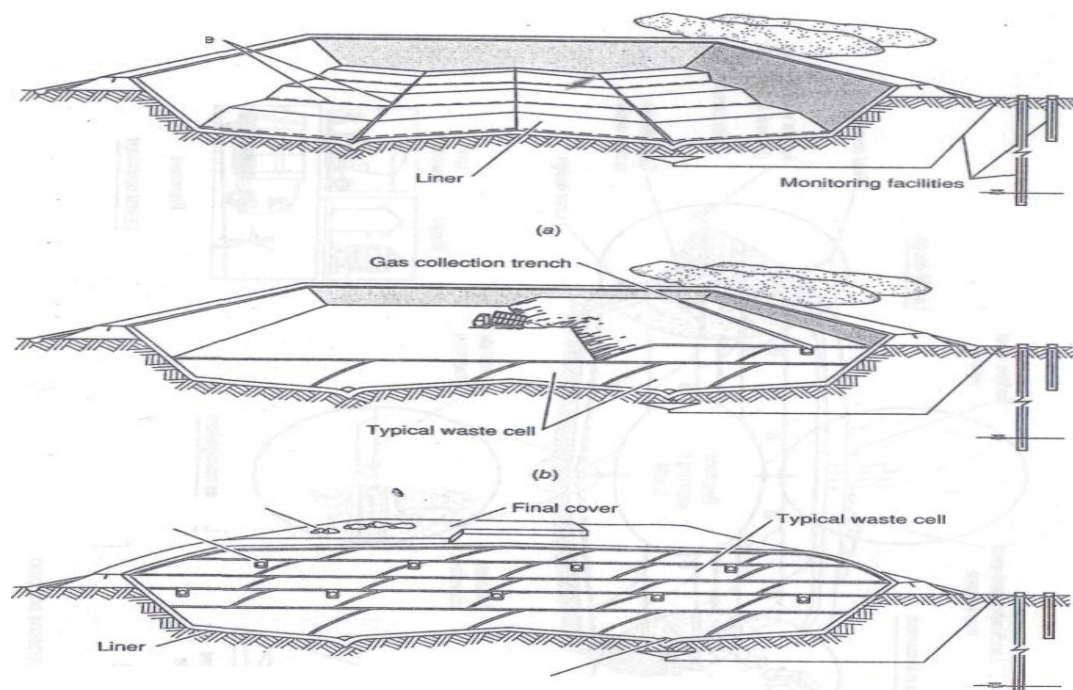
Development and completion of a solid waste landfill: (a) excavation and installation of landfill liner, (b) placement of solid waste in landfill, and (c) cutaway through completed landfill.
